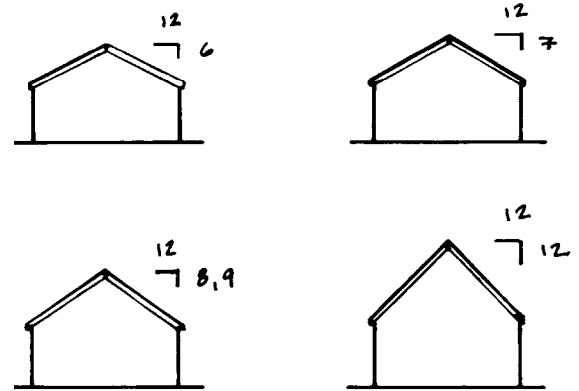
For gable roofs, the roof slope of additions and new buildings should not have less than a 7-in-12 pitch, and not more than a
